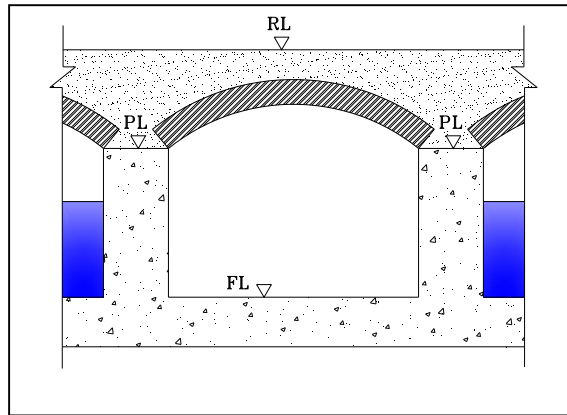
Cross section of bridge type No.1 (arch bridge)
